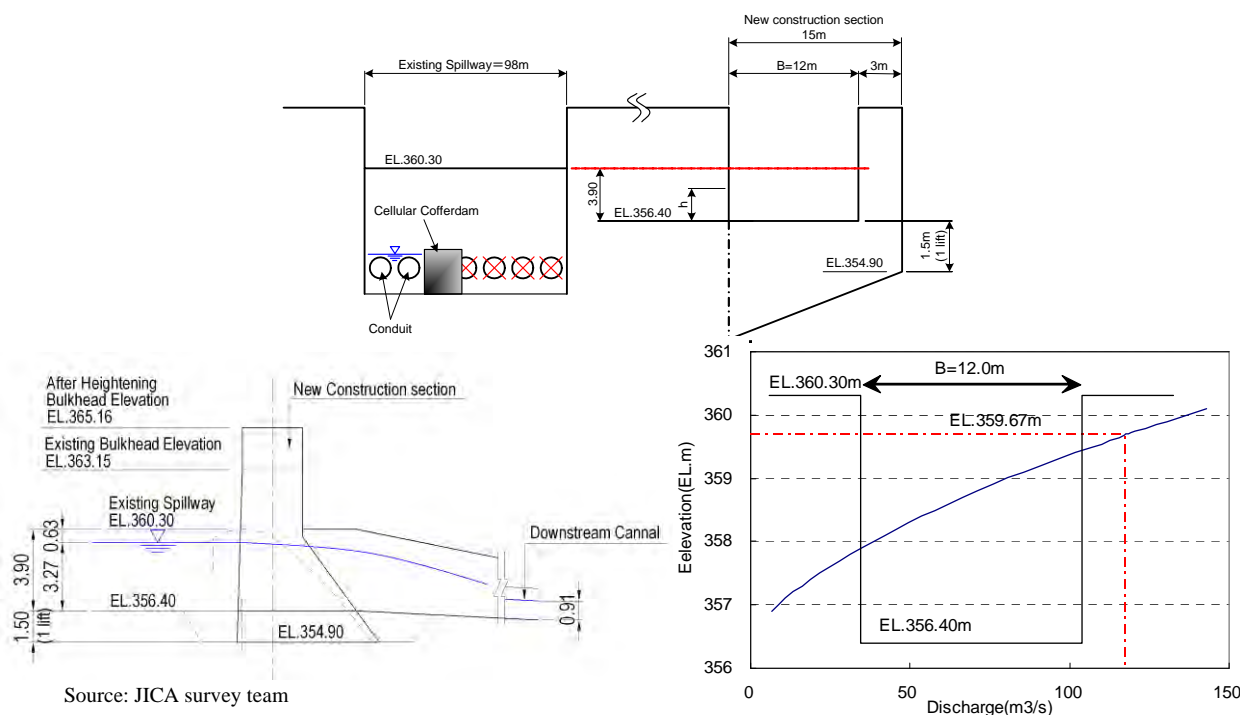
Scale of Excavation of Wing of Dam Body
